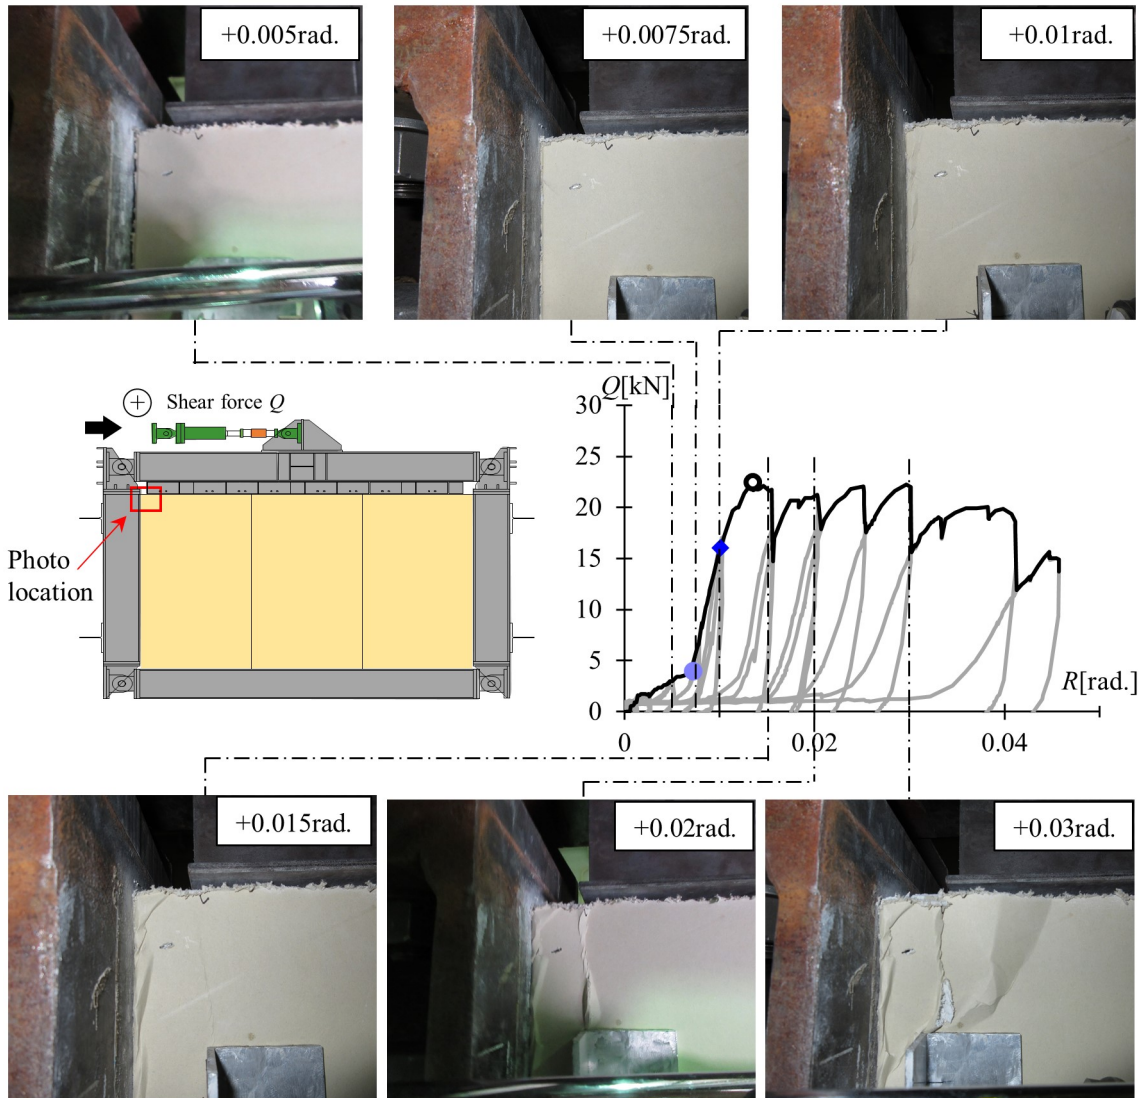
Damage to the gypsum board at loading cycle from 0.005 rad to 0.03 rad (Specimen S12.5\*2, top left corner).
